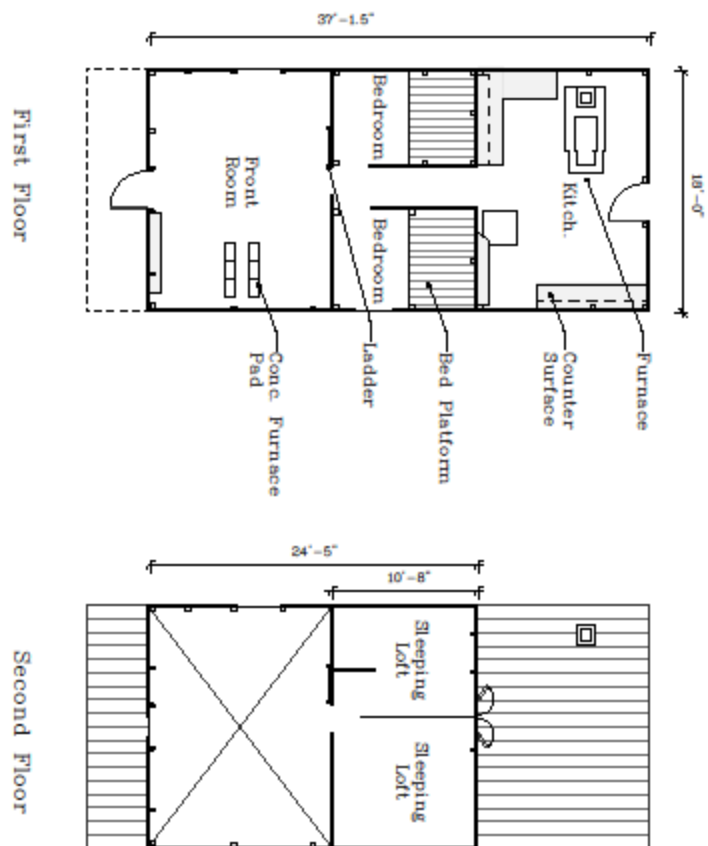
Floor Plan of Tent 38 at Cypress Campground
